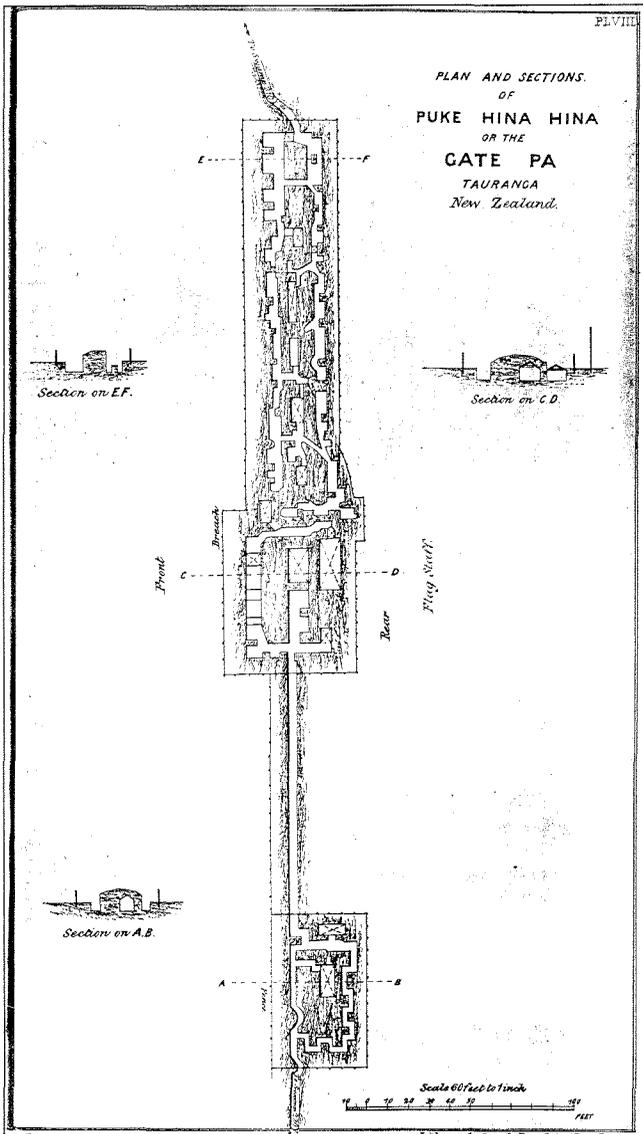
Plan and cross-sections of Gate Pa, Tauranga. (Mould 1869:Pl.8).
